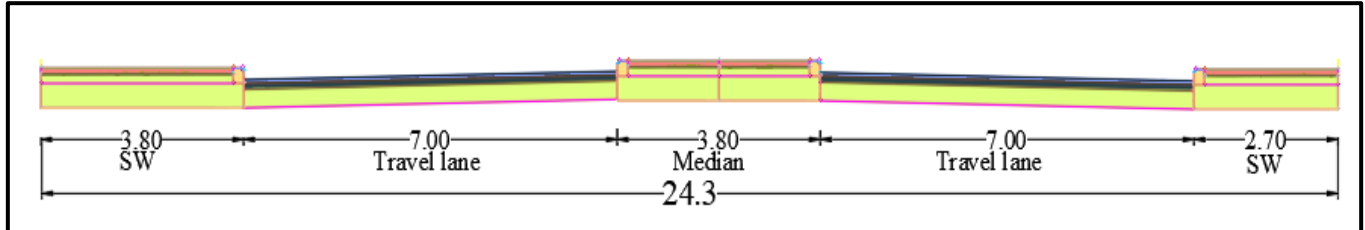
Existing Cross Section NO. 8 – Between Faisal and Al- Masakiya Street
